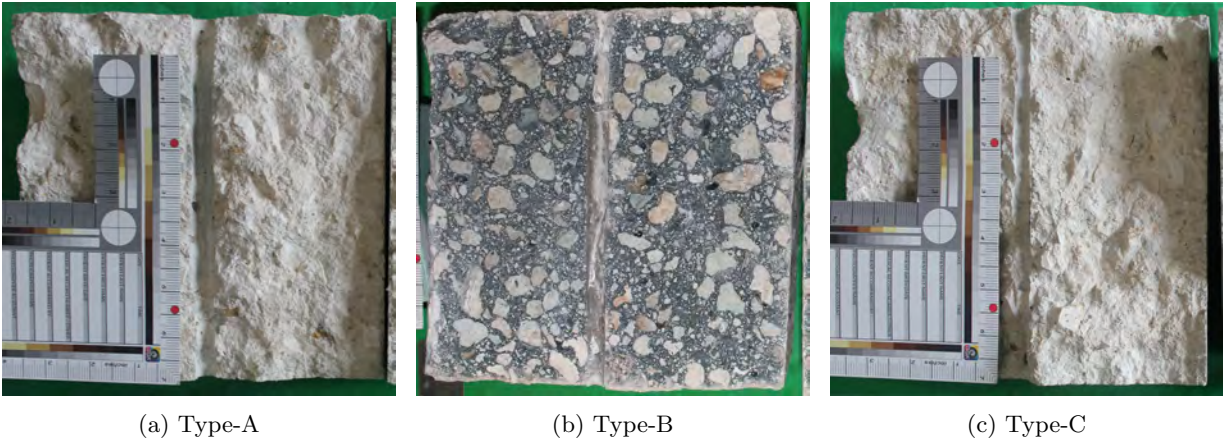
Bond failure at concrete interface of all rebar types in virgin state
